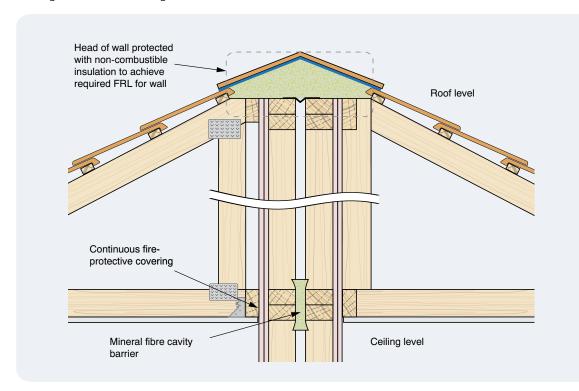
Roof space option 1 extending SOU bounding fire-protected timber walls to roof level.
